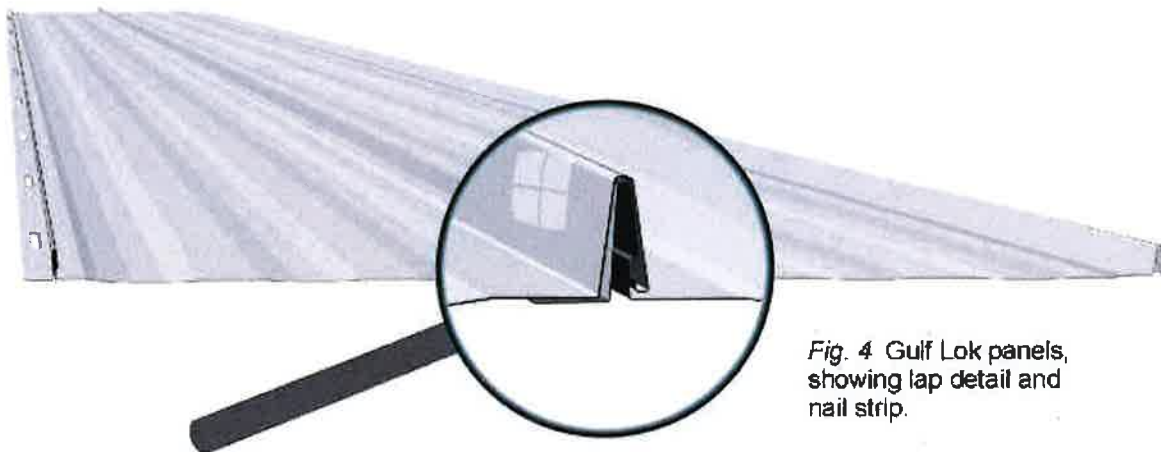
Gulf Lok panels, showing lap detail and nail strip.
